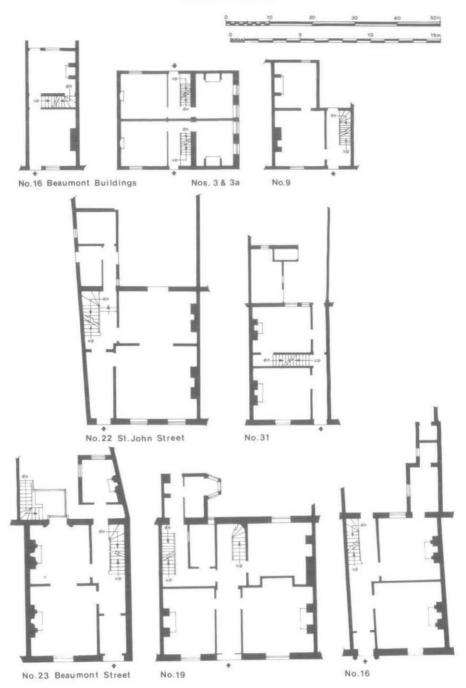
Houses in St. John Street, Beaumont Street and Beaumont Buildings: specimen ground-plans. (Re-drawn, with amendments, from architects' plans provided by Messrs. Cluttons.)
